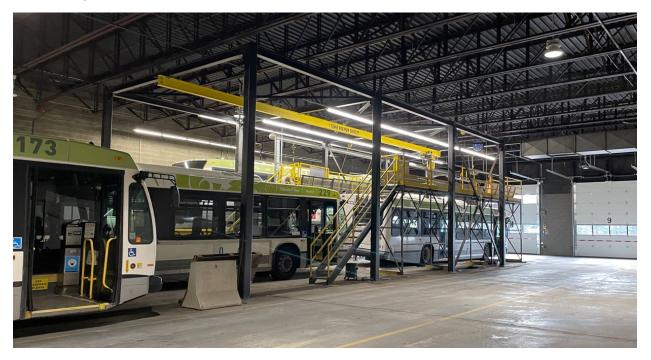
Rooftop Access Platform at the Fort William Road Transit Garage
